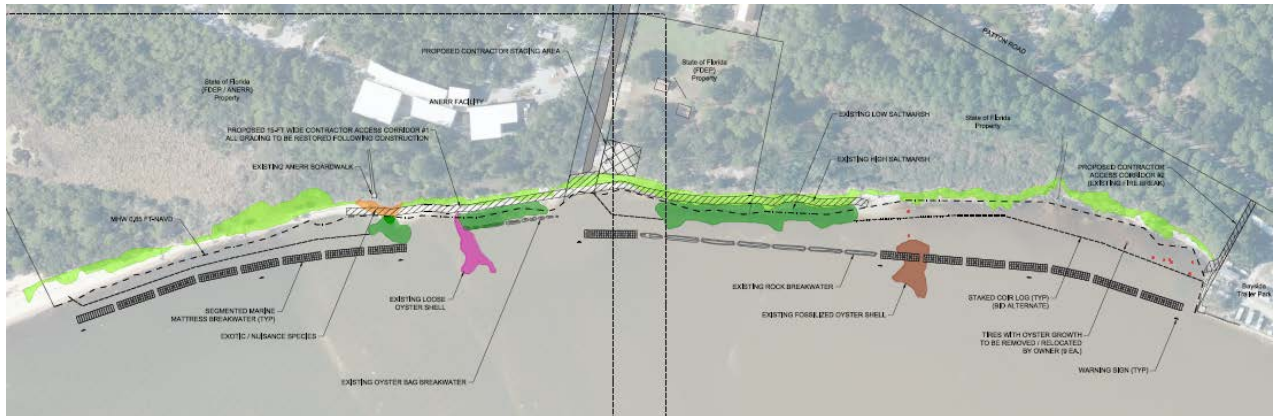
Cat Point Living Shoreline Plan View (*Taylor Engineering*)
